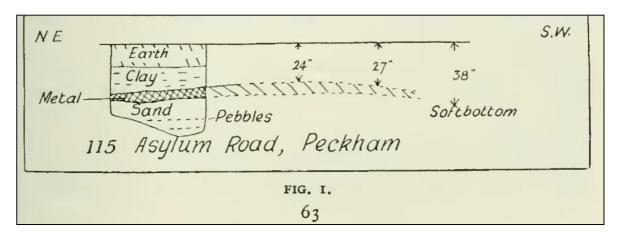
Section drawing 115 Asylum Road (Davis 1935)
